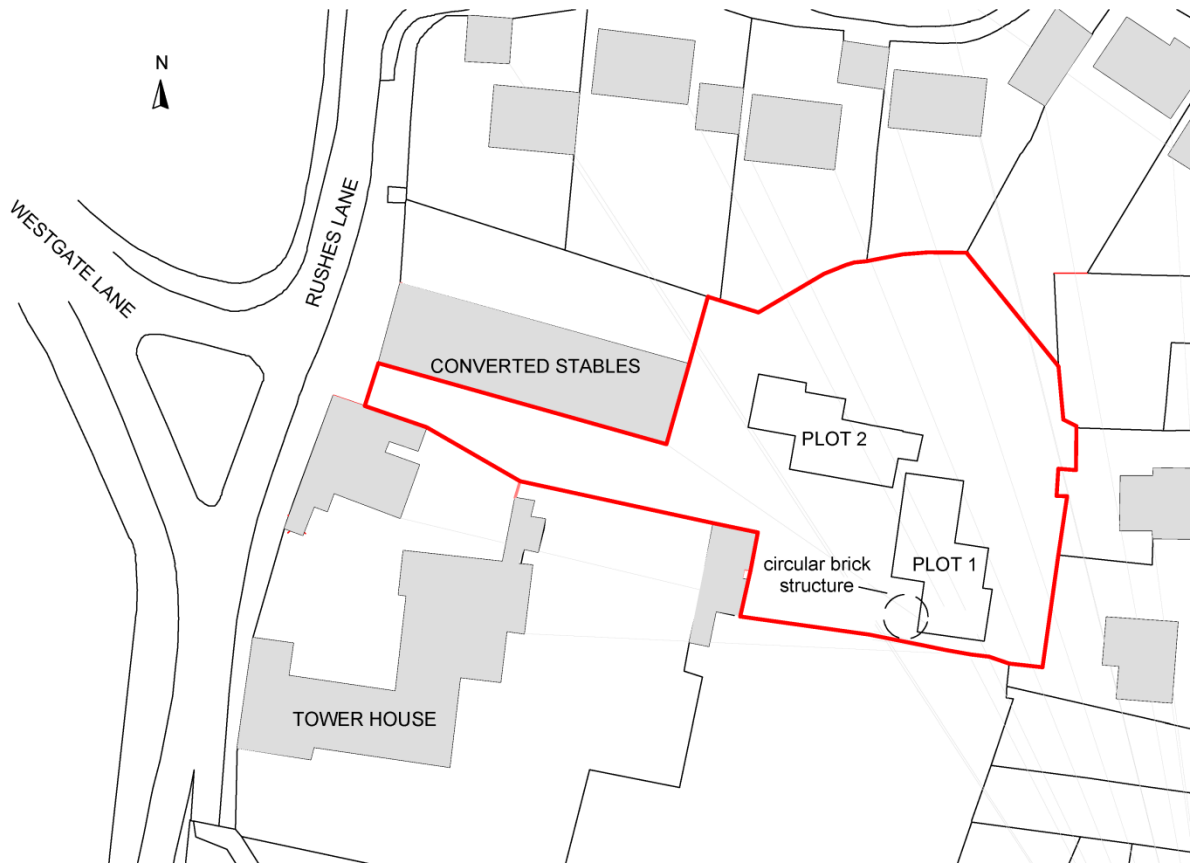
Location plan showing new buildings and circular structure. (adapted from plan supplied by client)
